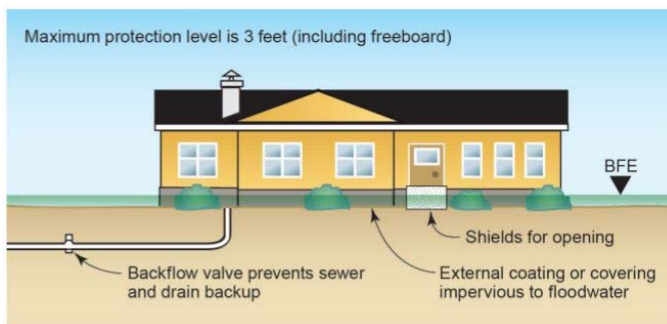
Dry floodproofing by reinforcing foundation walls, using flood shields over openings, and installing backflow valves. (Source: FEMA P-1037)
